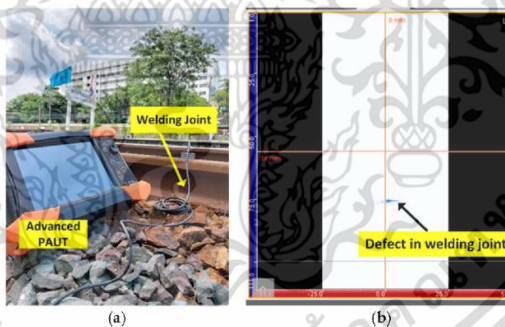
Onsite experimental setup: (a) advanced phased array ultrasonic testing (PAUT) on welding joint of the steel rail; (b) PAUT detection with defect in the welding joint.
